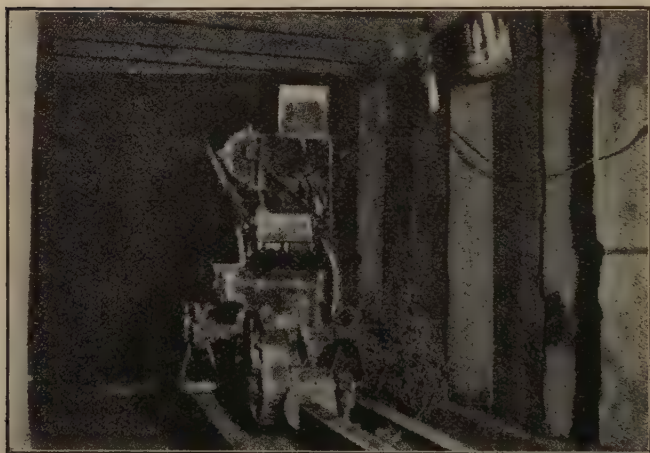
A view showing the boring and jacking machine used to drive the 8-inch perforated pipes into the fill.
